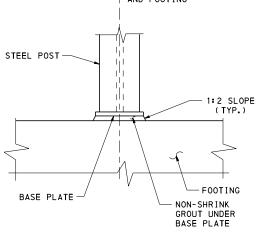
STEEL POST WITH BASE PLATE CONNECTION TO SPREAD FOOTING
